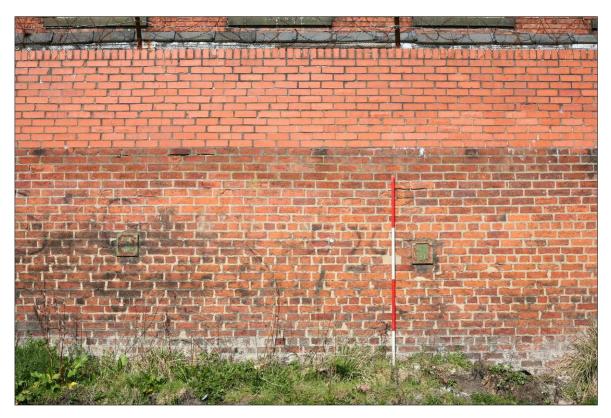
Detailed view of the end of cast-iron brackets running through the South wall.
